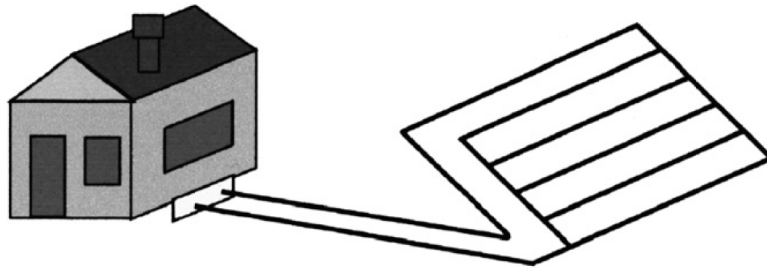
Horizontal-type ground heat exchangers connection in parallel.
